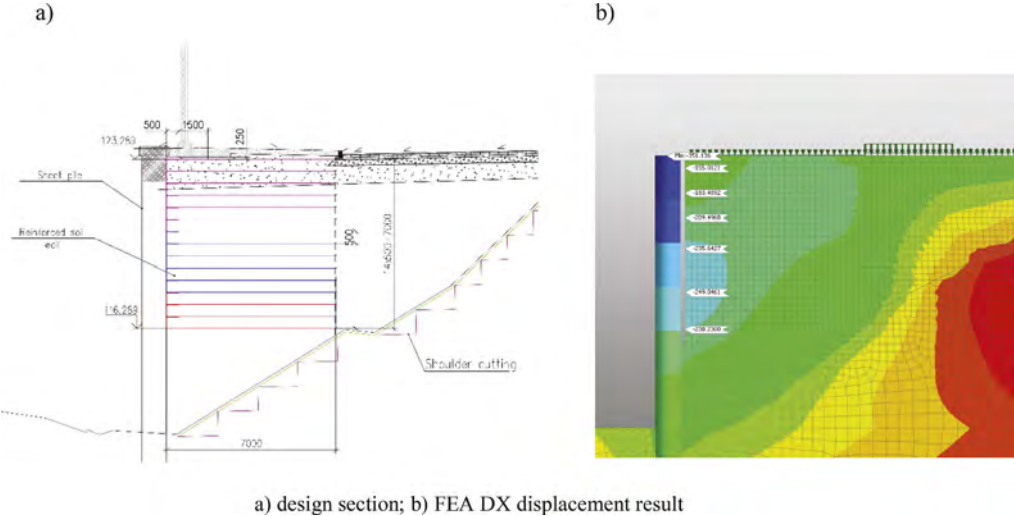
Reinforced soil wall at “Perm - Berezniki”.
